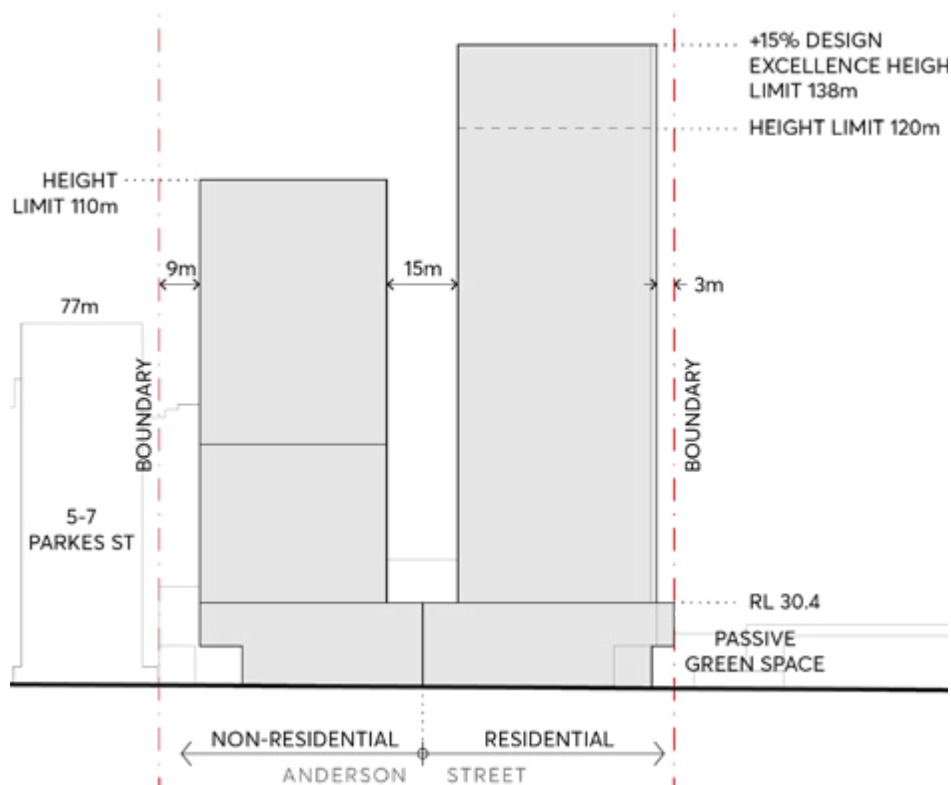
Building envelope Anderson Street elevation
